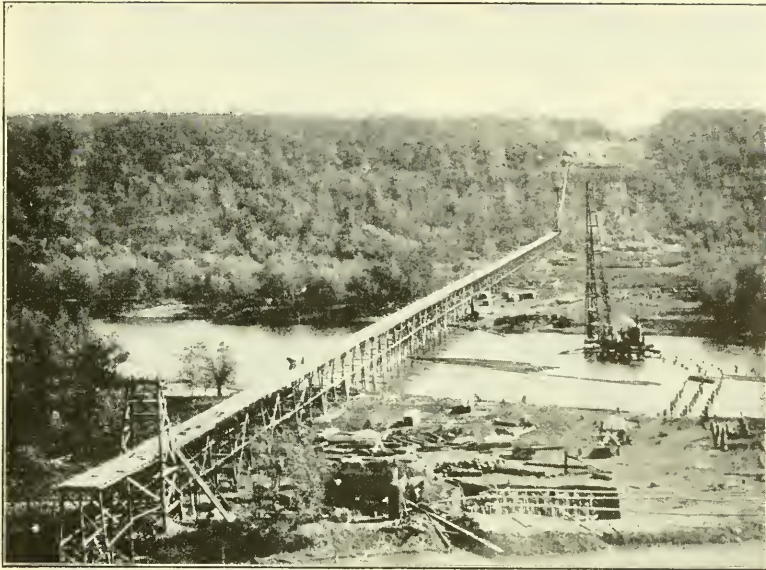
PILE-DRIVER, AND TRESTLE FOR HANDLING CONCRETE.
